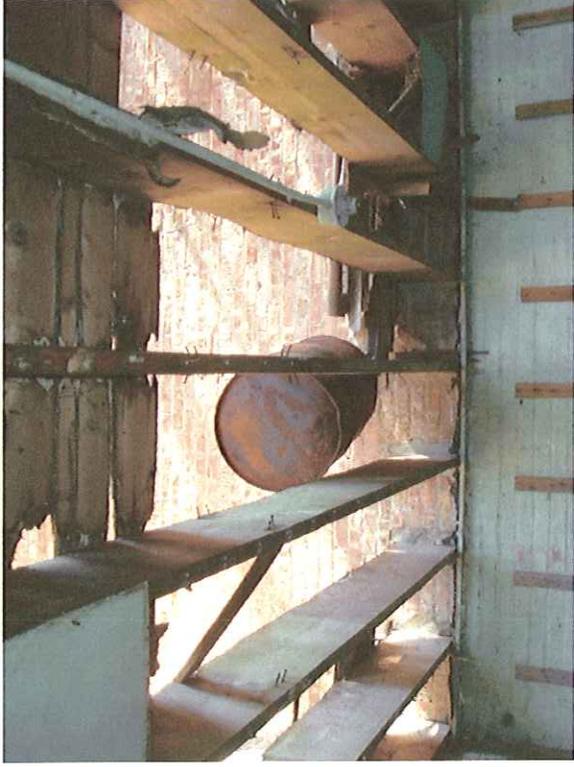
Drum (contents unknown) in rafters above rest room adjacent to Room 4.
